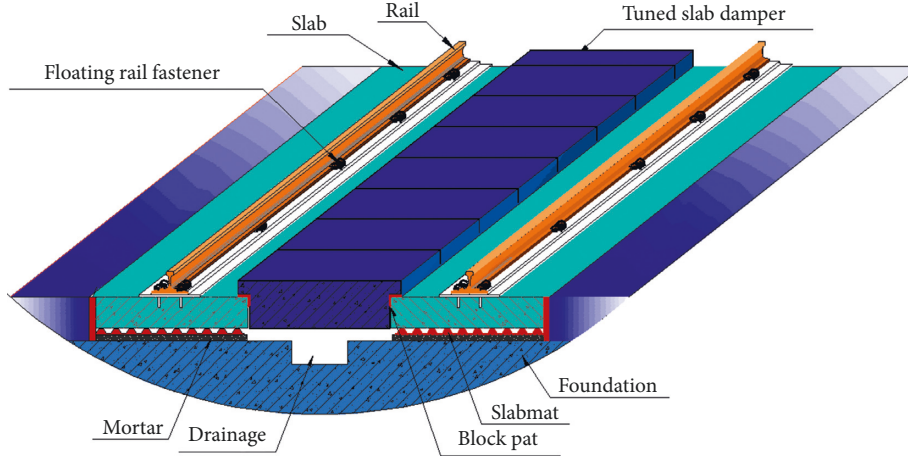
Track schematic diagram of the fastener/tuned slab damper/floating slab.
